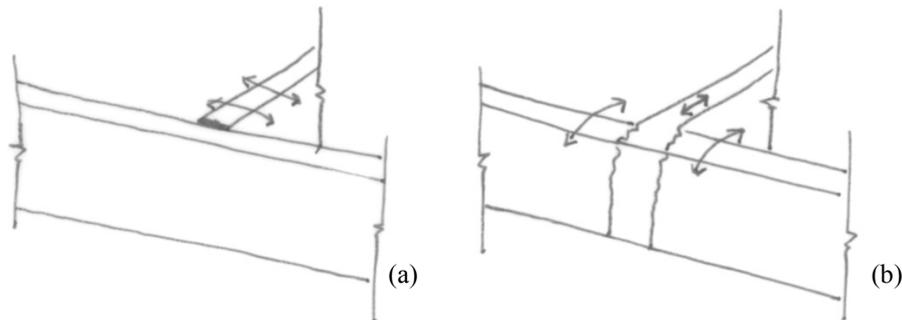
Cracks along the joints of loading walls and partitions: (a) damages between in-plane and out-of-plane walls, (b) damages between out-of-plane walls and the orthogonal in-plane wall
